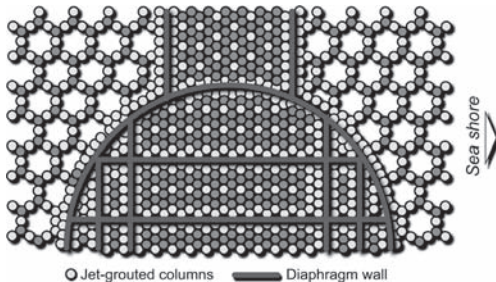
Tower foundations—Jetgrouting treatment scheme.
